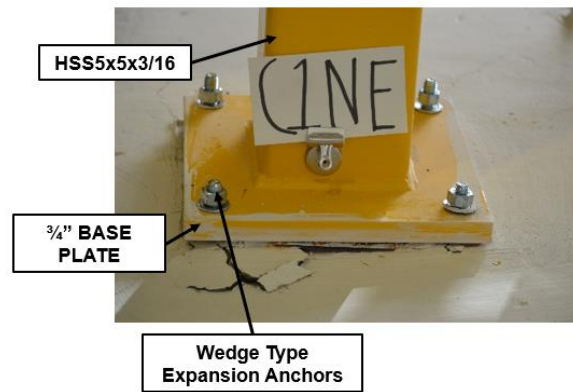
COLUMN TO BASE CONNECTION (POST-TEST)
